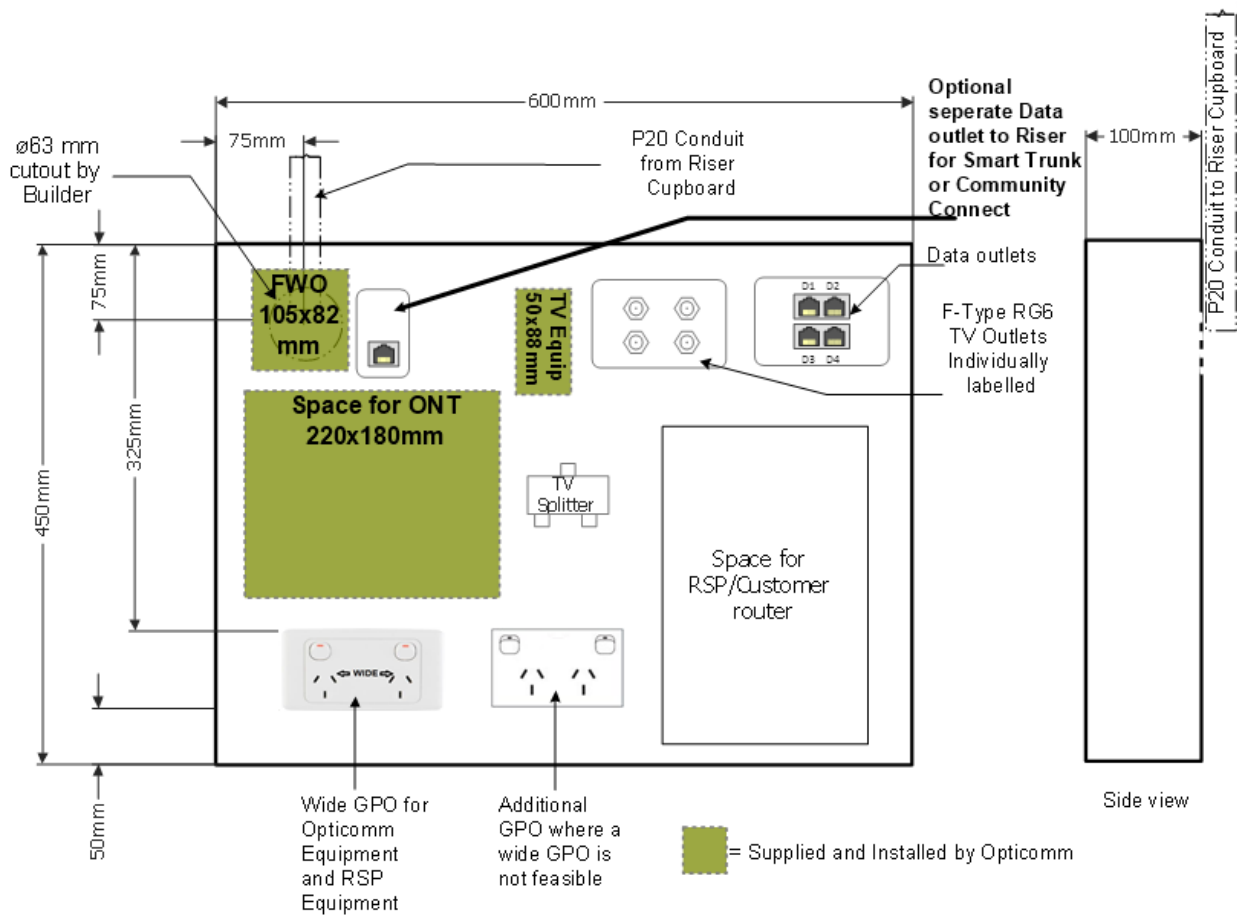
Community Connect/Smart Trunk Apartment Equipment typical layout
